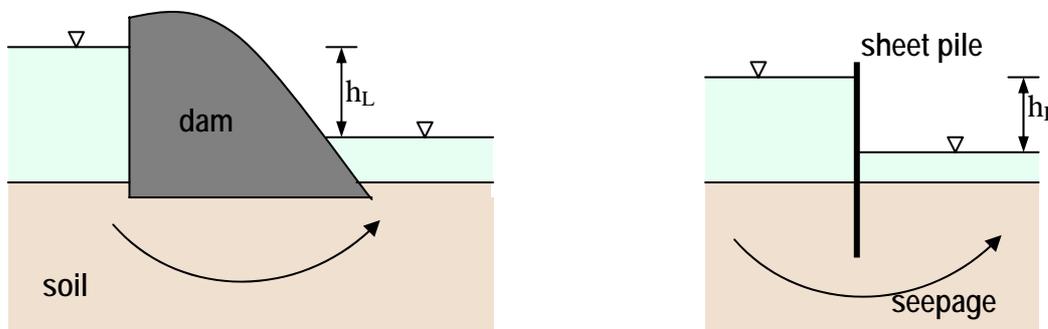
Seepage beneath (a) a concrete dam (b) a sheet pile
